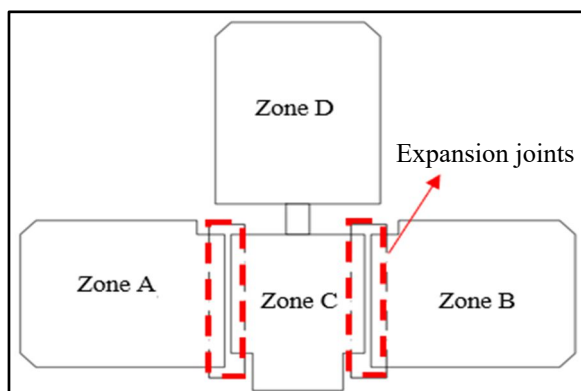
Plan view of the Central Laboratory Building of Universitas Andalas
